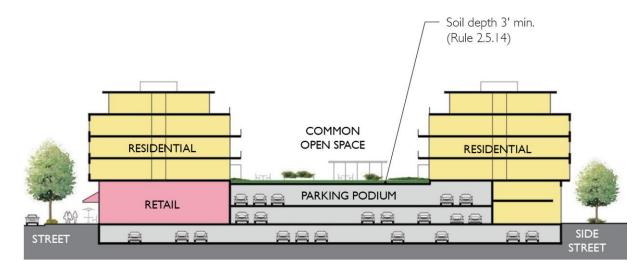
Vertical Mixed-Use Building with Parking Podium and Ground Floor Retail
